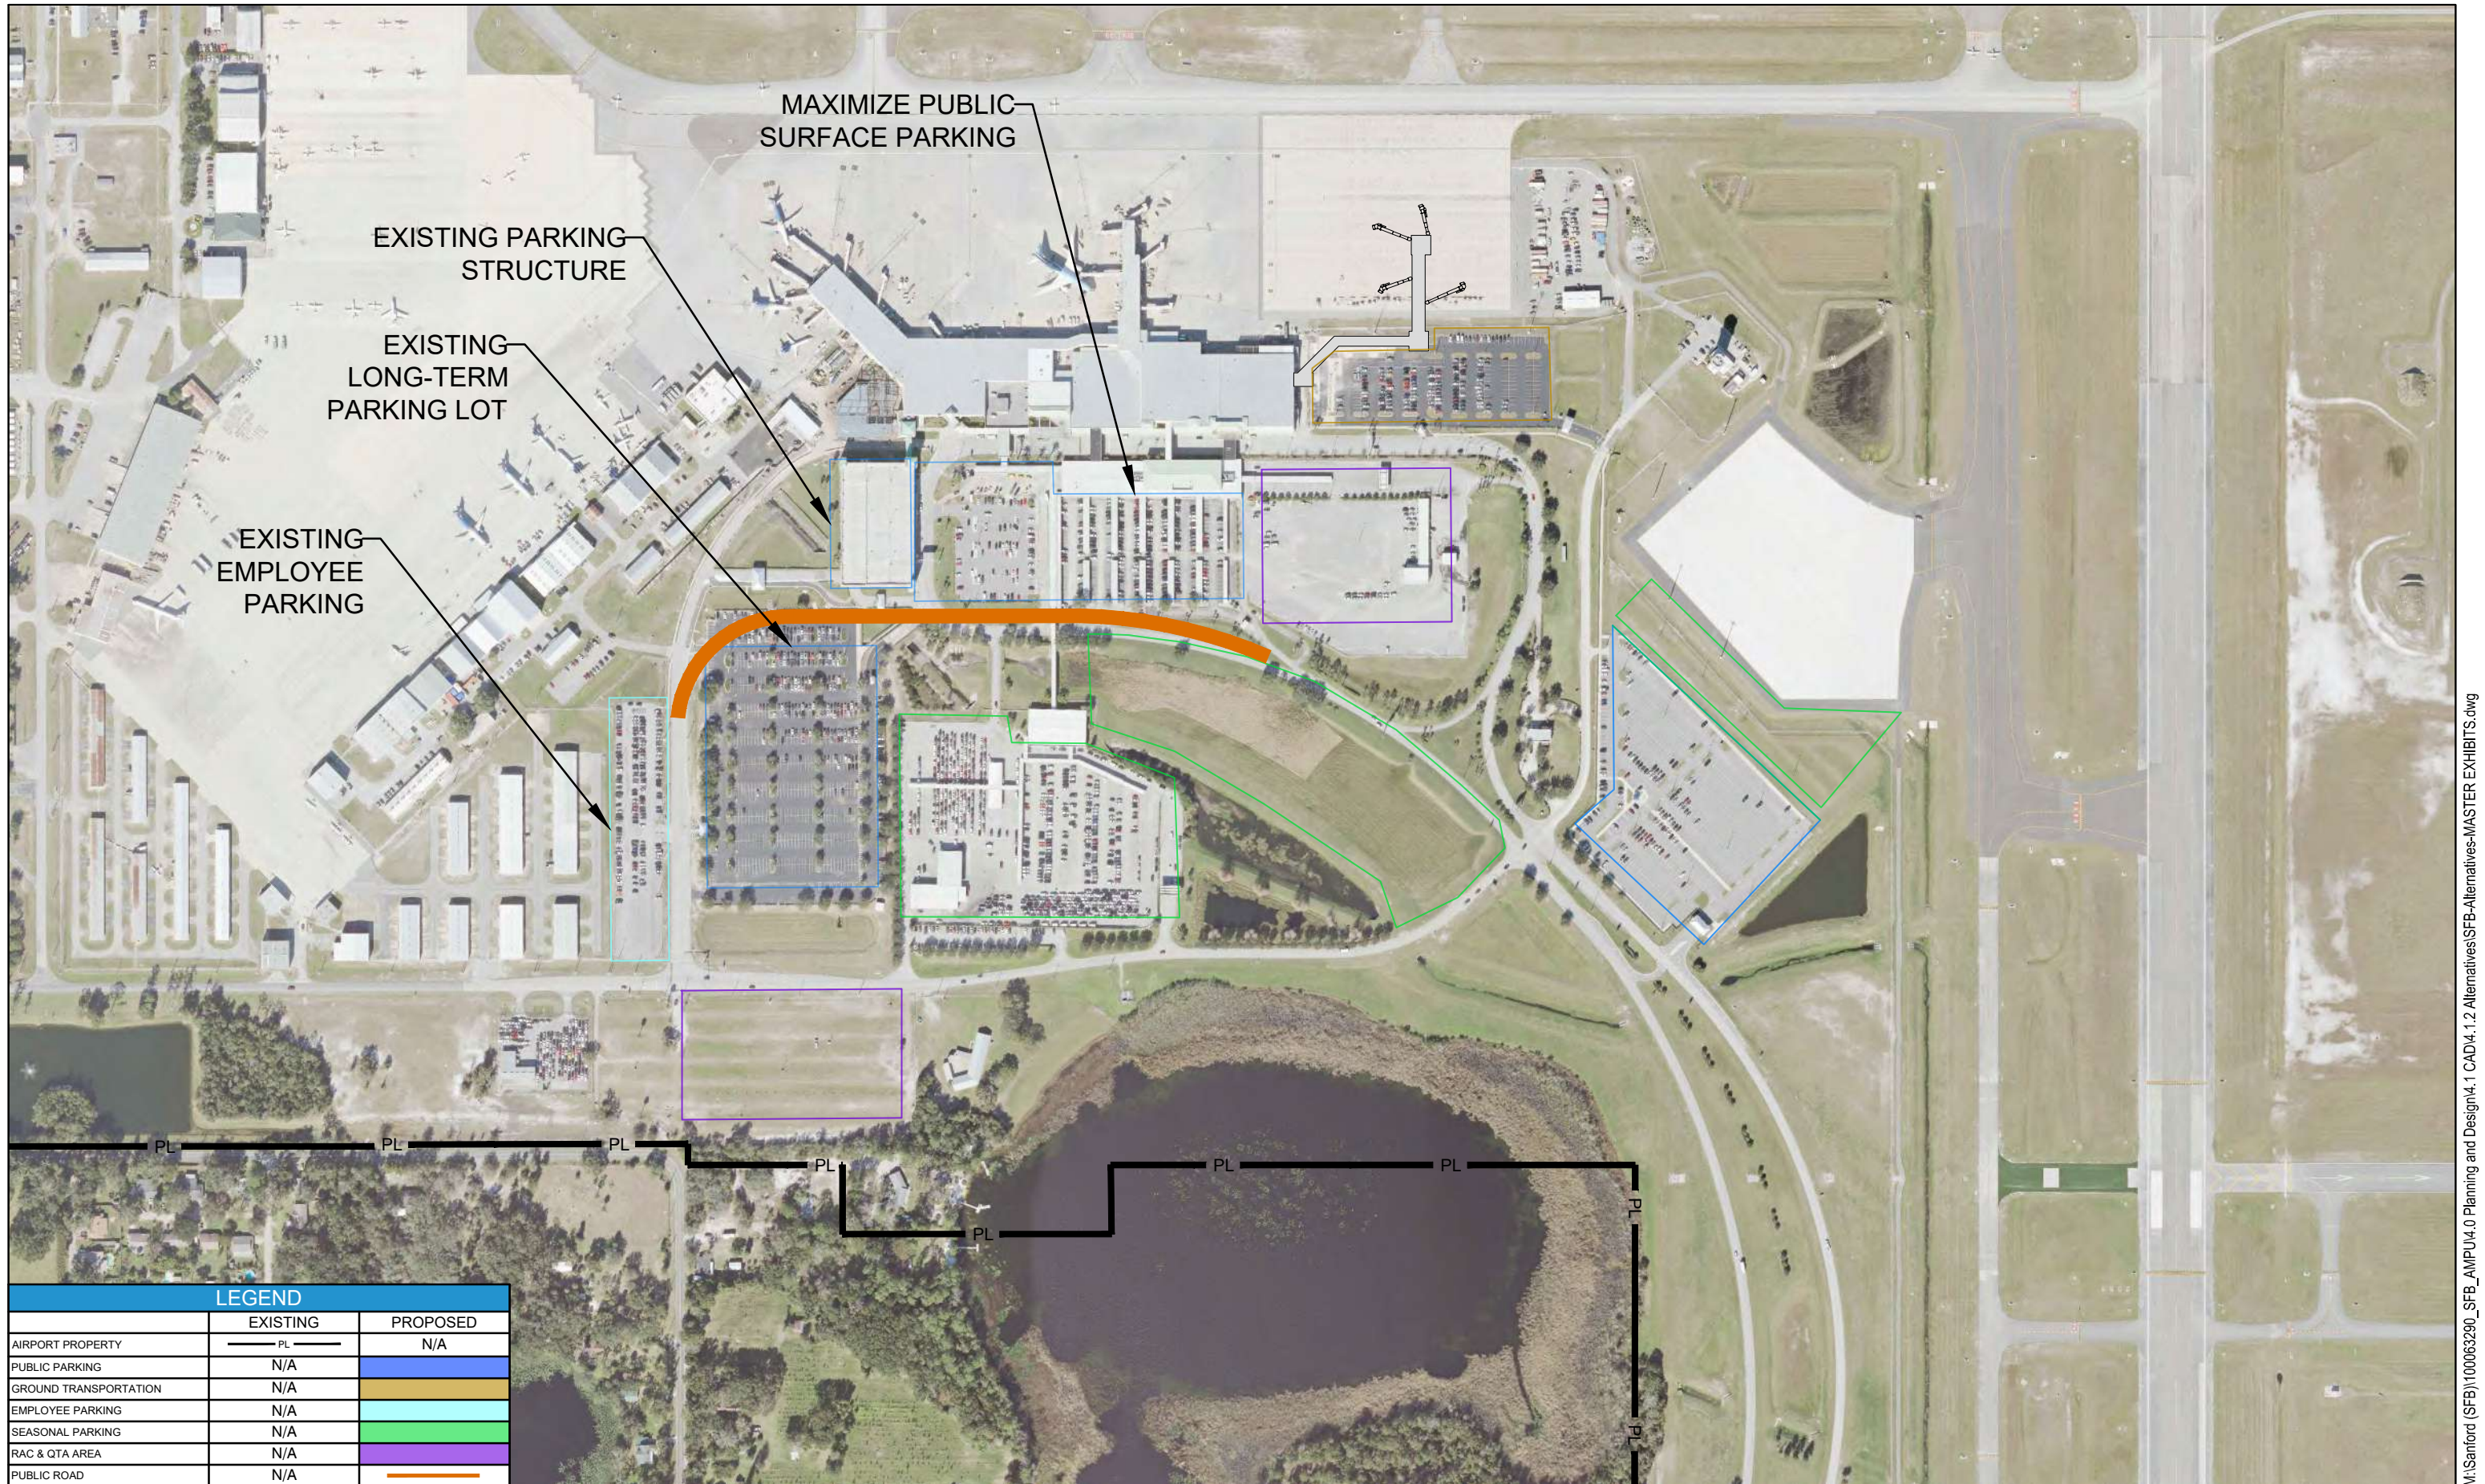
DEVELOPMENT ALTERNATIVE 3 - LANDSIDE ROADWAY AND PARKING
